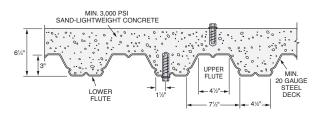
Figure A - Titen HD® screw anchor installed in the top and bottom of a structural sand-lightweight-concrete and metal-deck assembly
